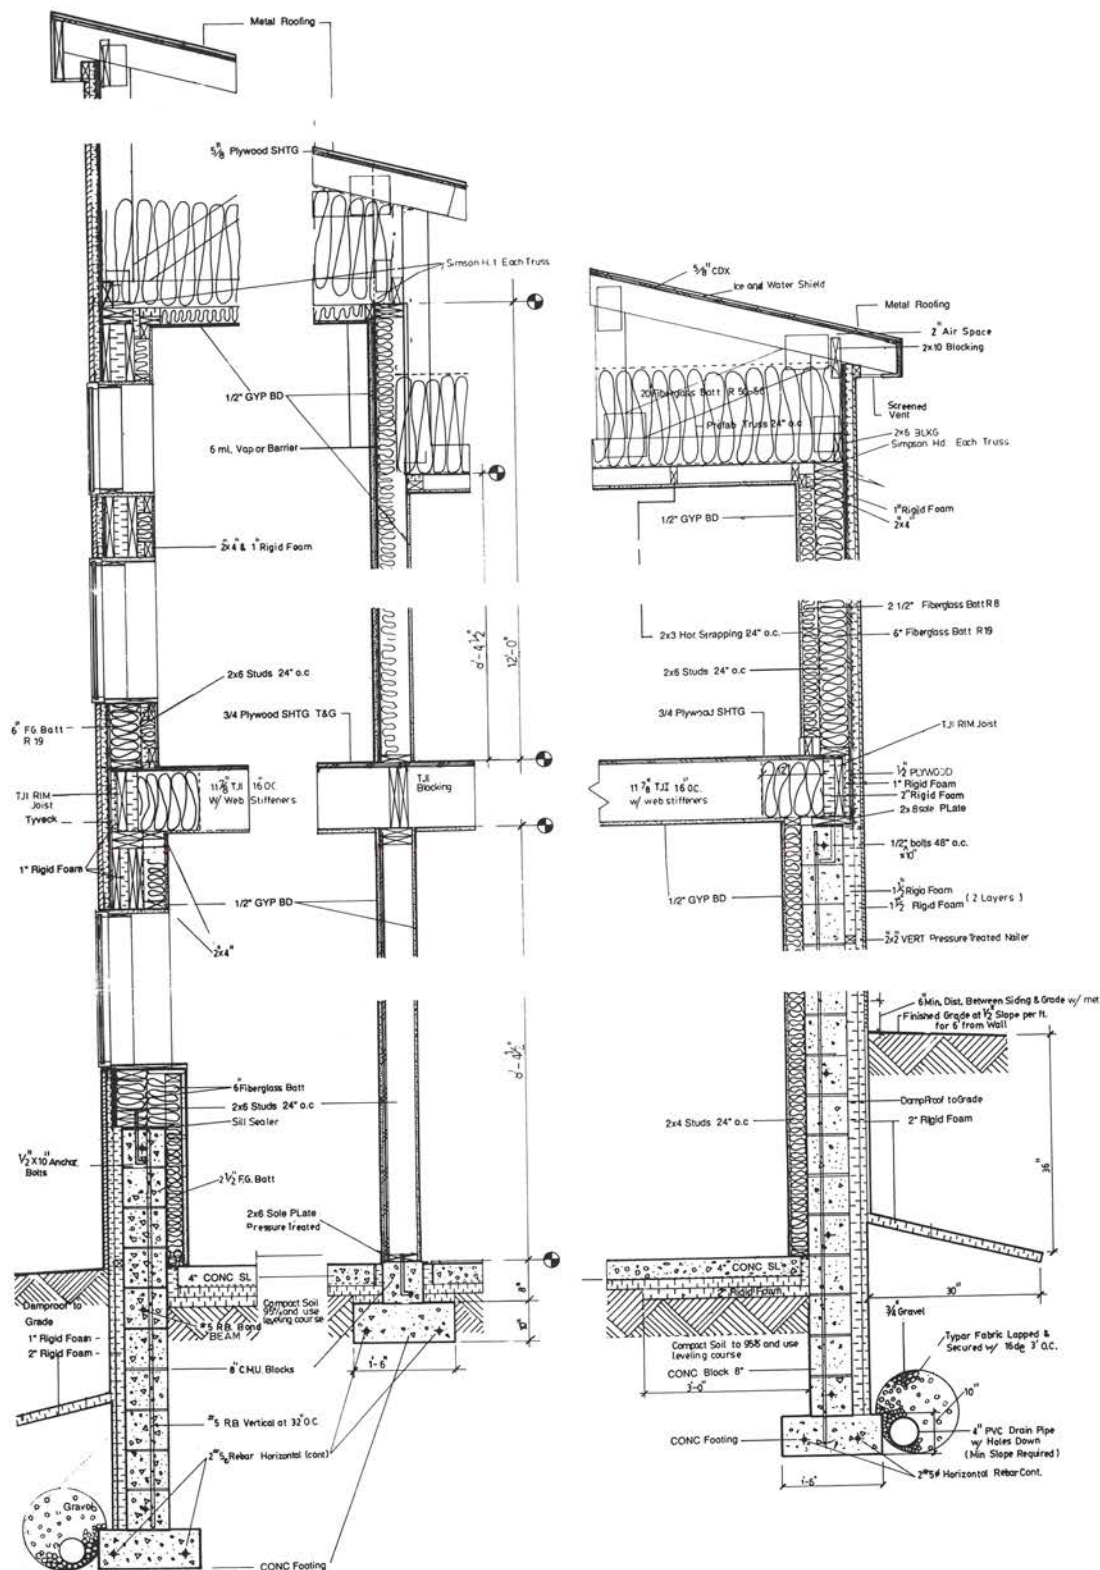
Section elevation of building envelope details for the Alaskan house.
